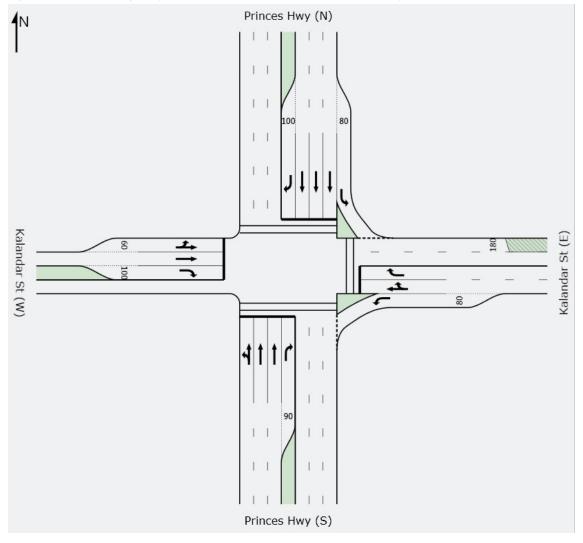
Princes Highway/ Kalandar Street Intersection - potential layout
